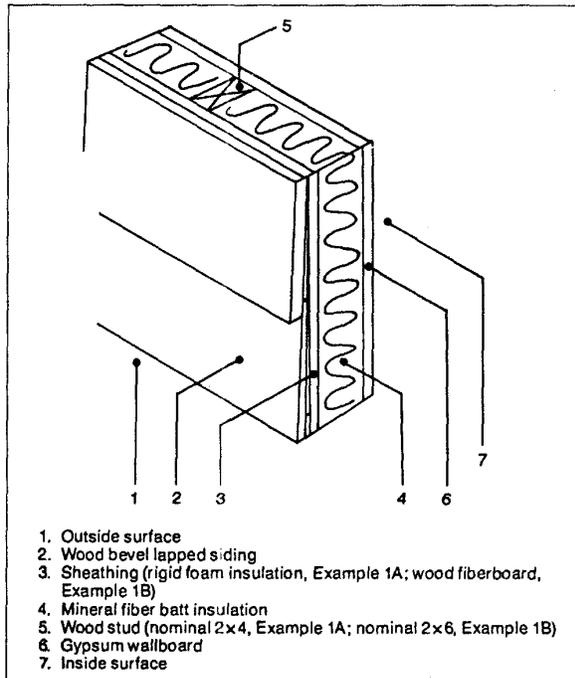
Insulated Wood Frame Wall (Examples 1A and B)
